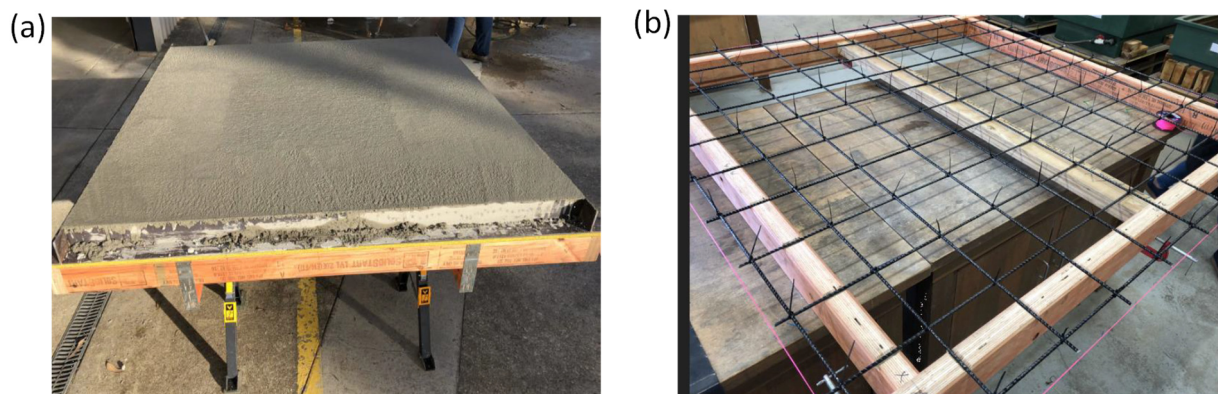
Photos of (a) a concrete slab after casting and (b) the single-layer reinforcement of a slab.
